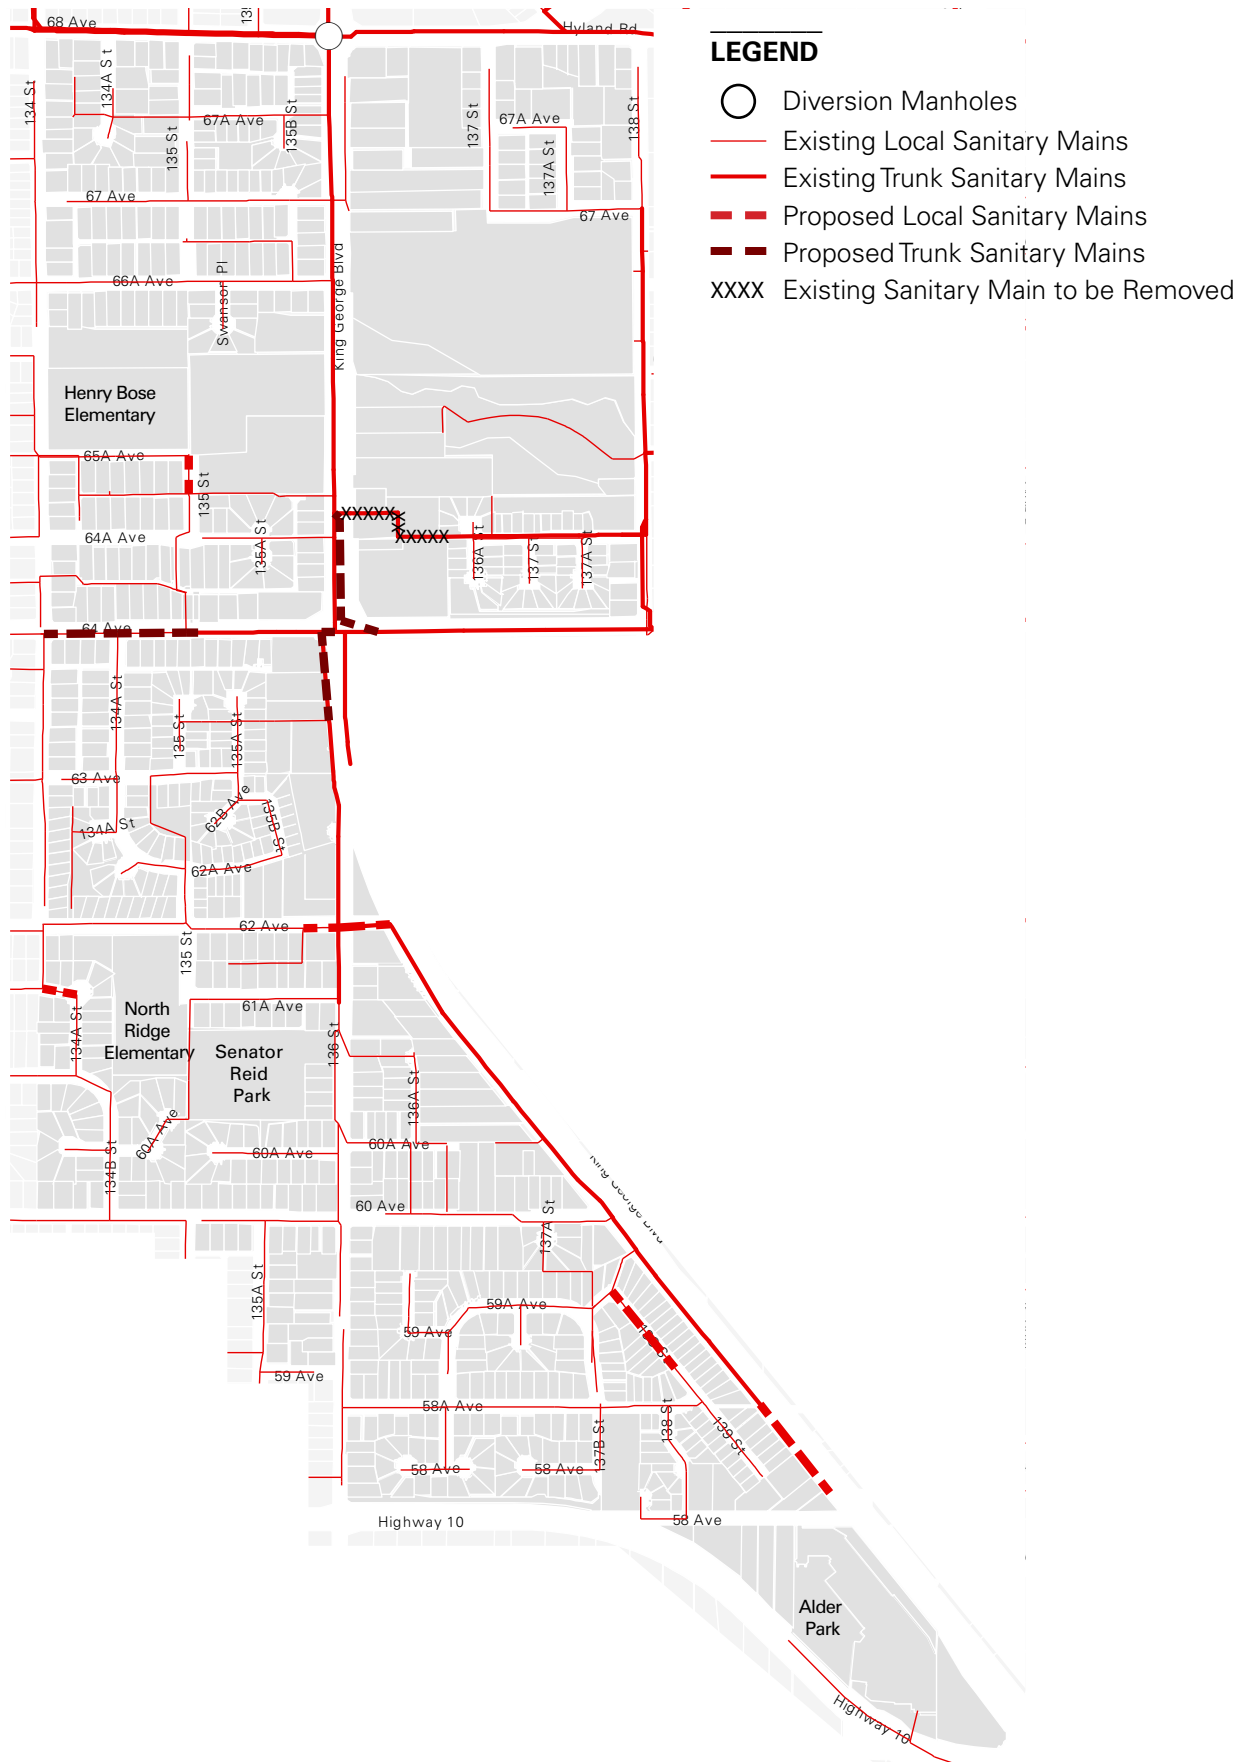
A SANITARY UPGRADES OUTSIDE OF PLAN AREA
